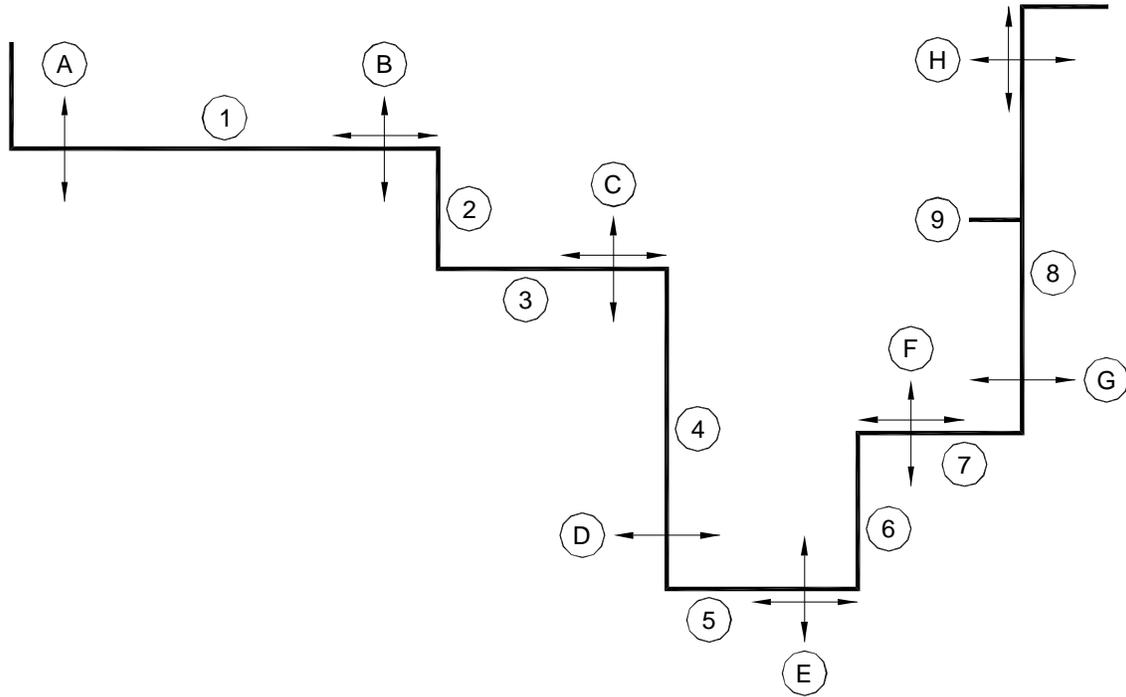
; Application Example #2 – Restraints for Adjacent Short Sections of Pipe or Duct
